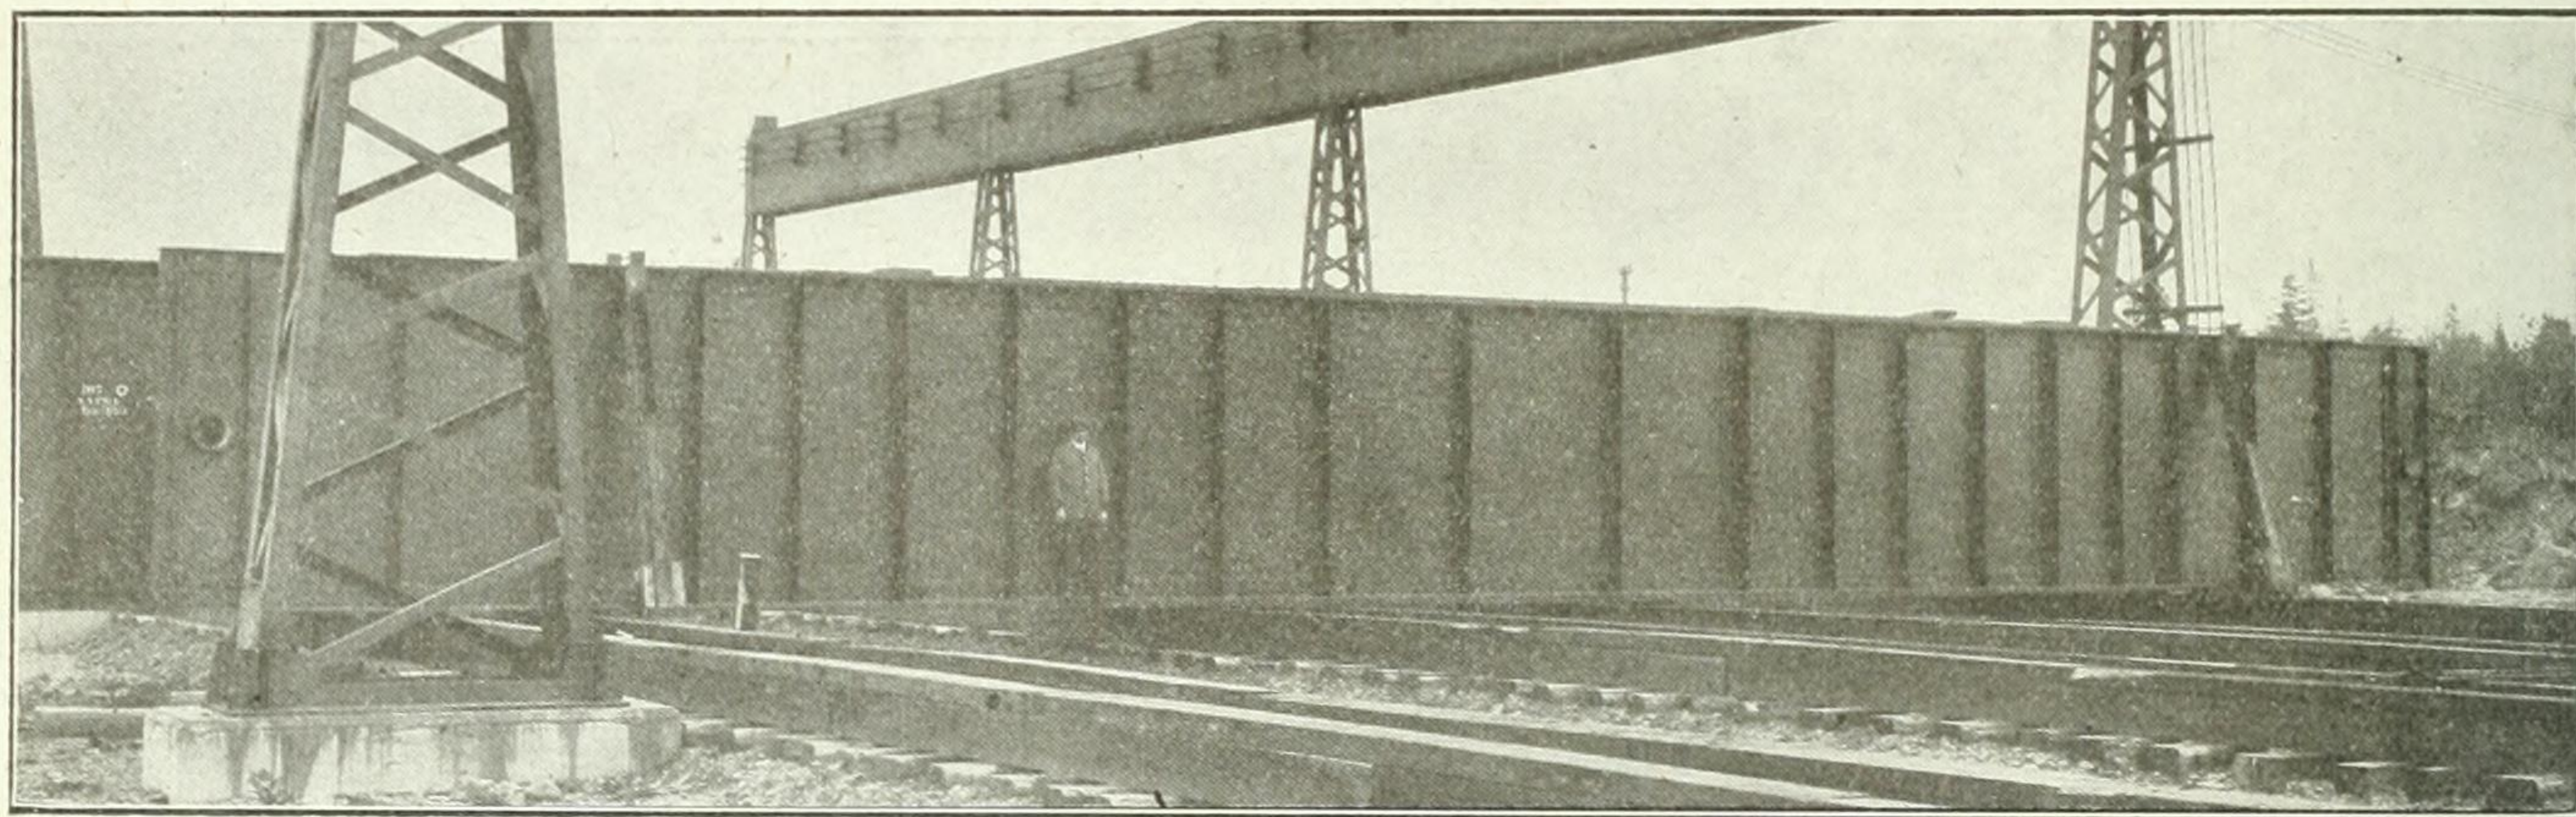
View showing one web of double floor beam at the bridge site storage yard. These girders are 10 ft. high and 88 ft. c. to c. 11-inch pins are used to connect the 60-ton floor beams to the post.
